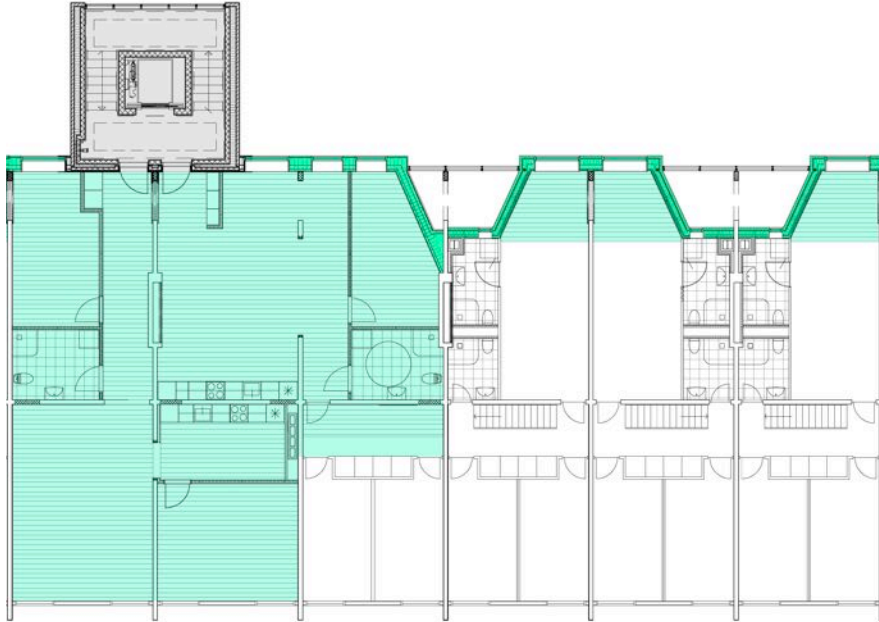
Tove Ditlevsensvej. Floor plans (1:250)
